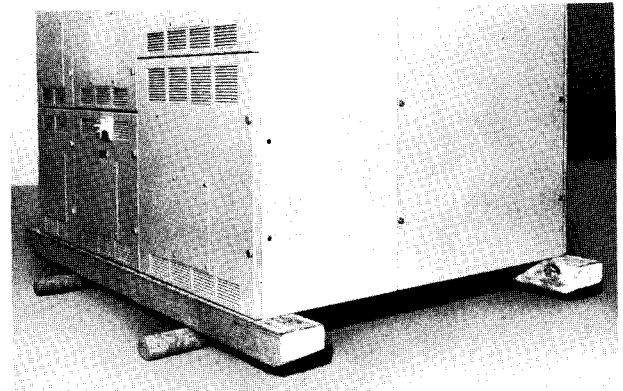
Jacks Removed and Switchgear Ready for Longitudinal Moving
